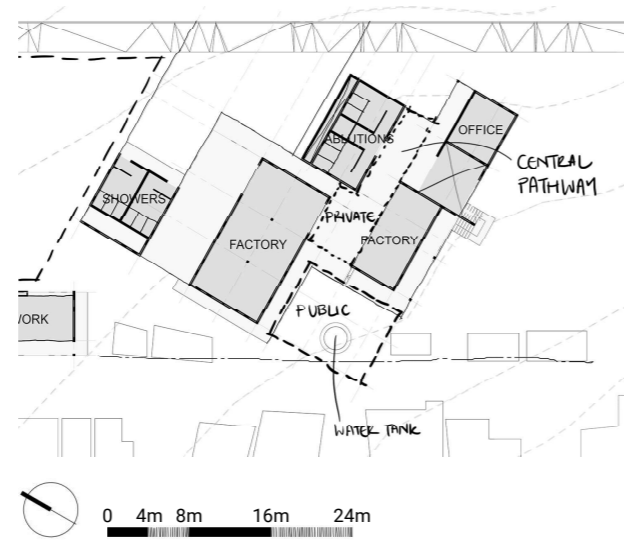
Iteration 3 waste management facility plan (Author 2021)
